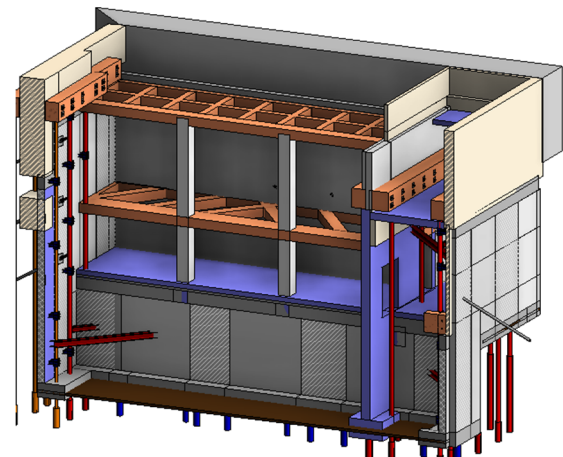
3D model - Final bracing solution: two levels in reinforced concrete.
